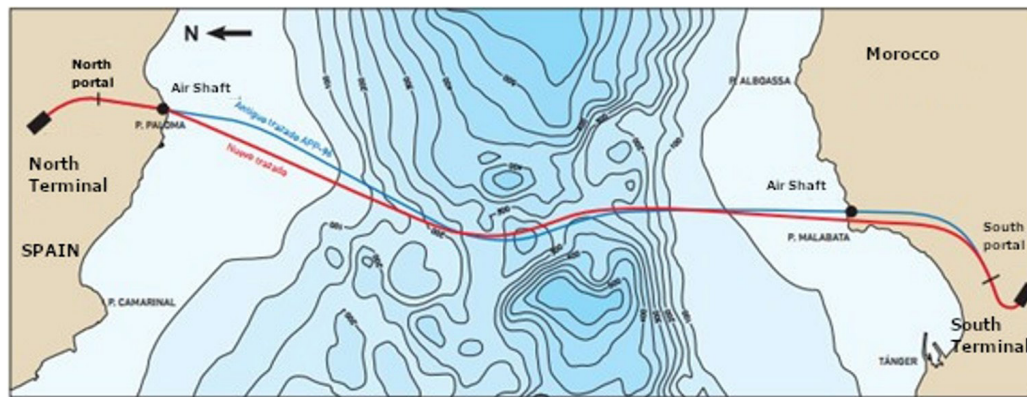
Tunnel layout proposal. Red line shows new proposal whereas blue one shows previous one.
